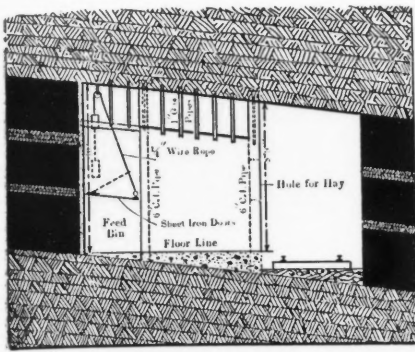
END ELEVATION OF FEED ROOM SHOWING ARRANGEMENT TO OPEN AND CLOSE THE SHEET-IRON DOORS OVER THE FEED BINS
